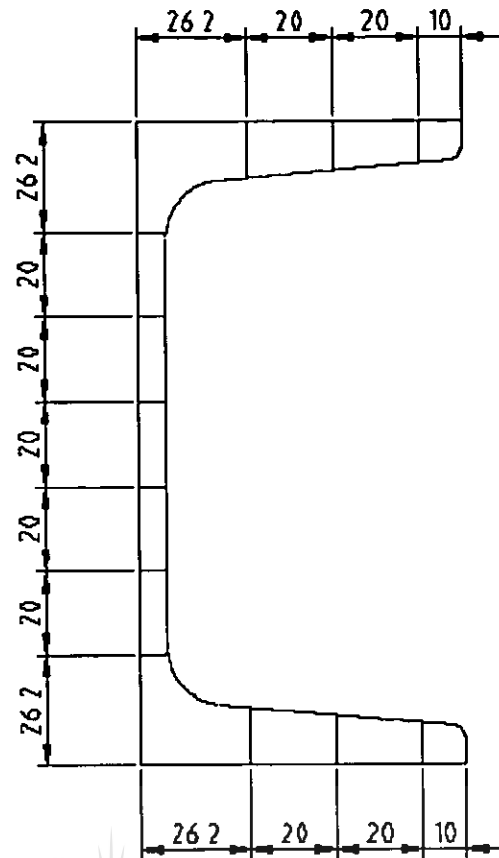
Dimensions of Channel Section Cuts (mm)
